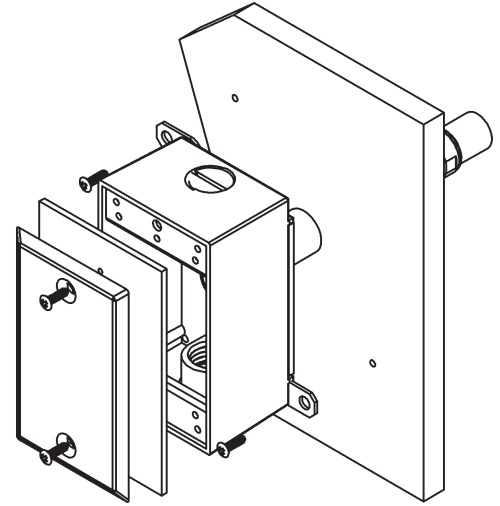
Duct unit in a Weatherproof (WP) Enclosure
